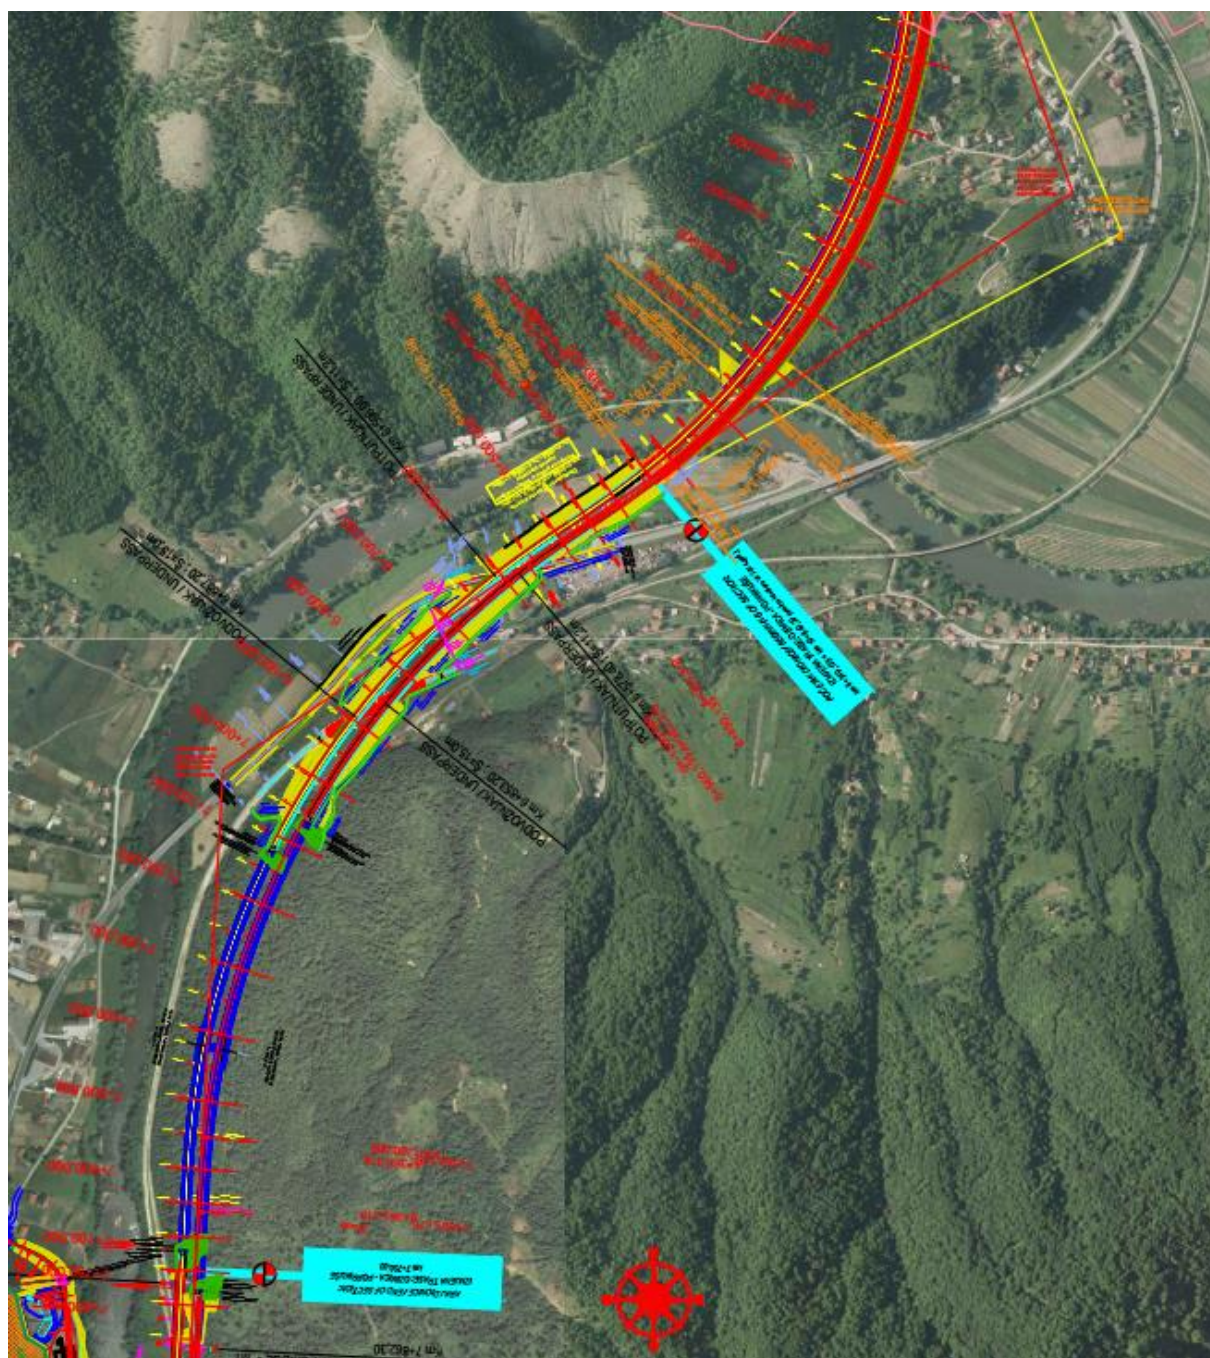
End of subsection with bridge over Bosna river (No. 9) crosses over existing main road, railway and tunnel Želeća
